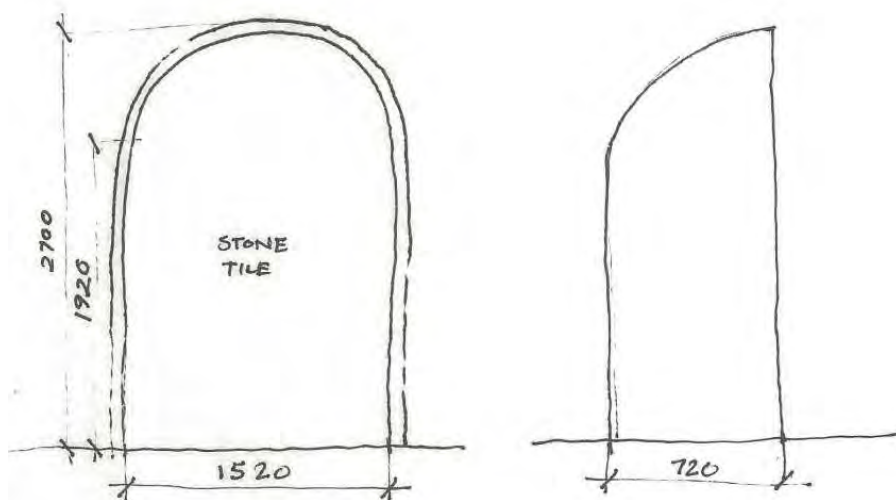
(a), Elevation and section of the Mihrab (Author, 2011)
